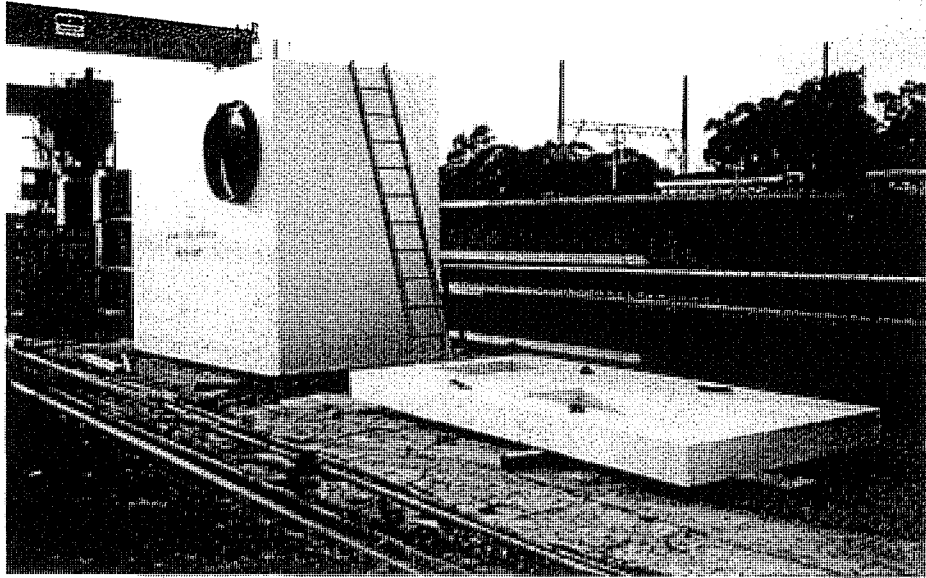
Williamson Street ILLS installation (Authors photograph, 1998).
